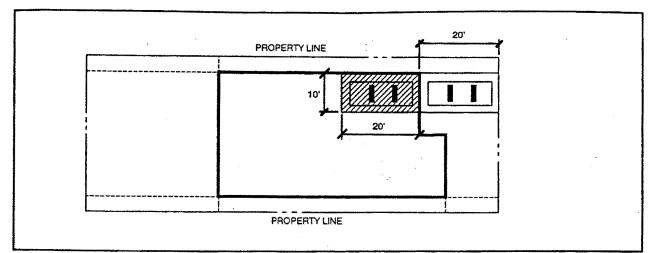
Parking Space Shown in Front Yard Area with Minimum 20' Setback to Building.
